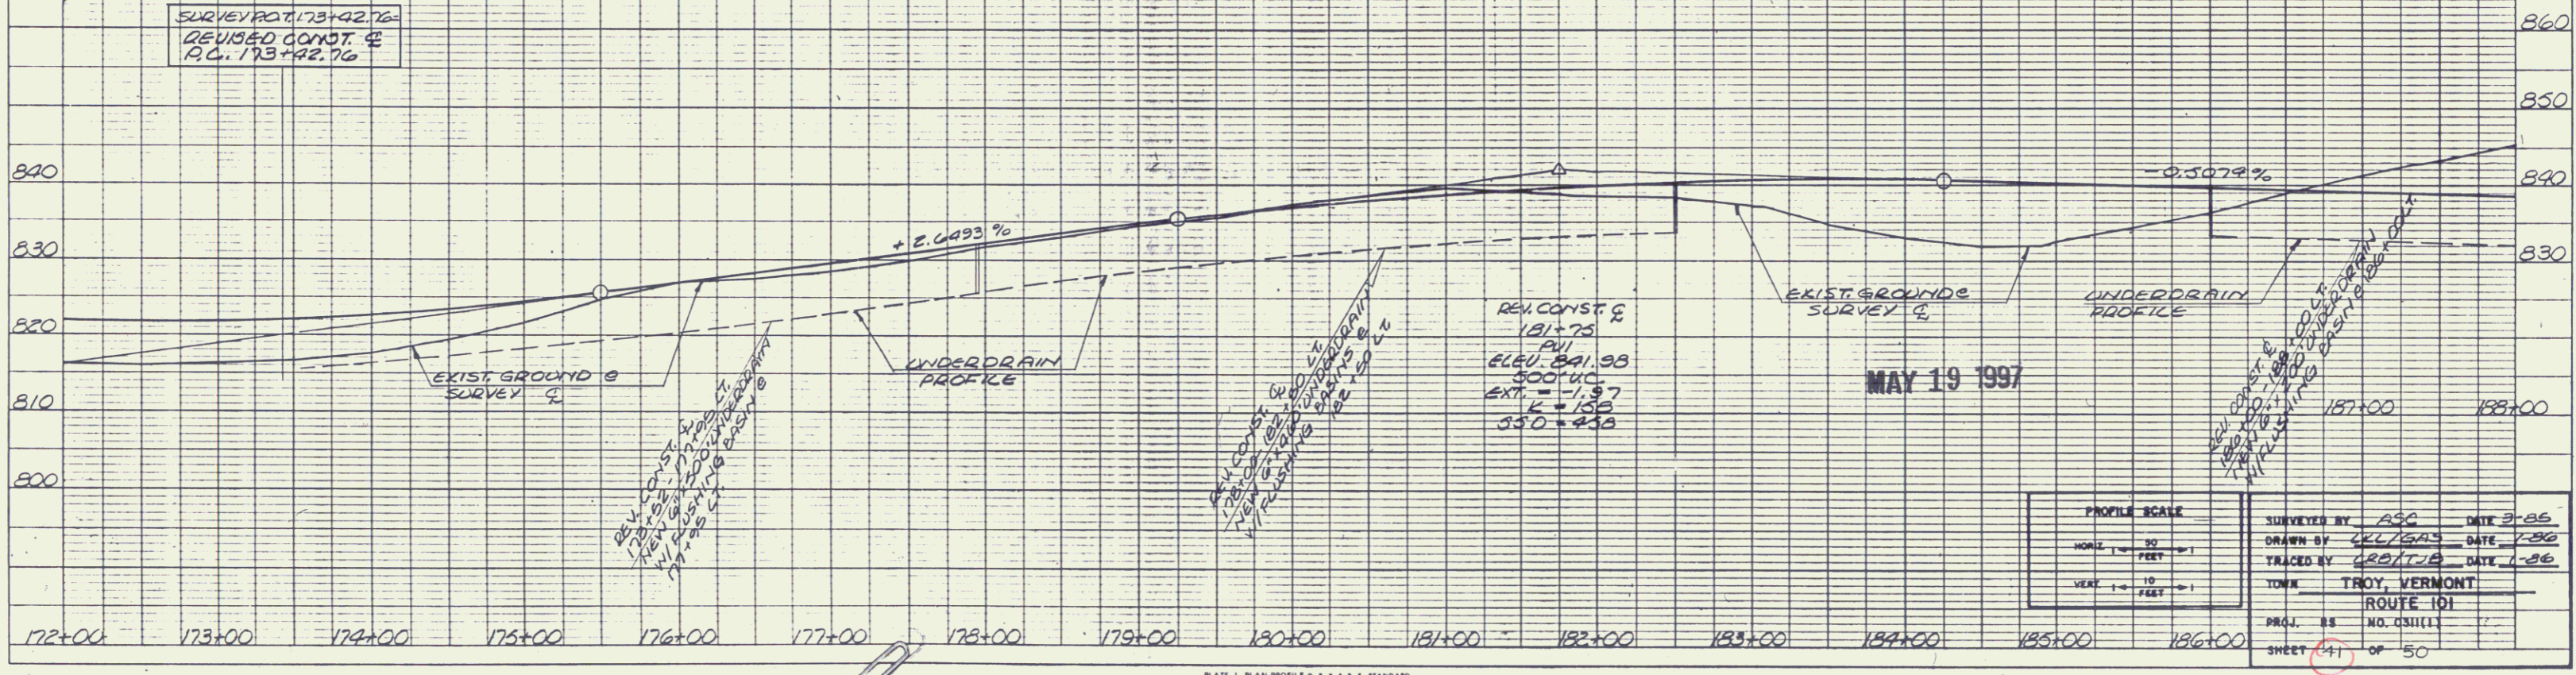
PLAN PROFILE OF F. & A. S. STANDARD
